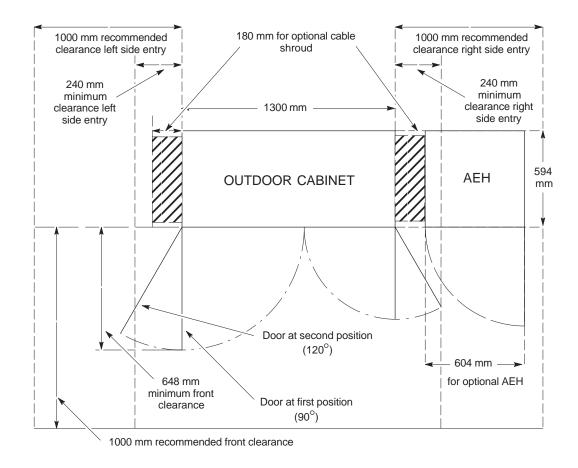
Outdoor cabinet site layout plan view (including optional equipment)
